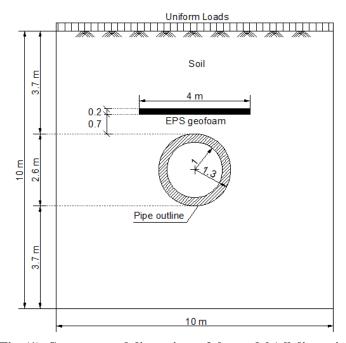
Geometry and dimensions of the model (all dimensions are in m)
